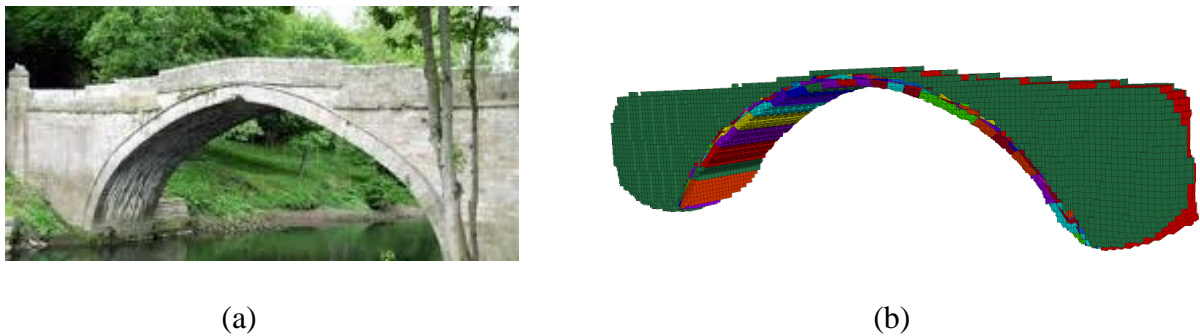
Lampton Bridge: (a) current deformed state; and (b) final Model.
